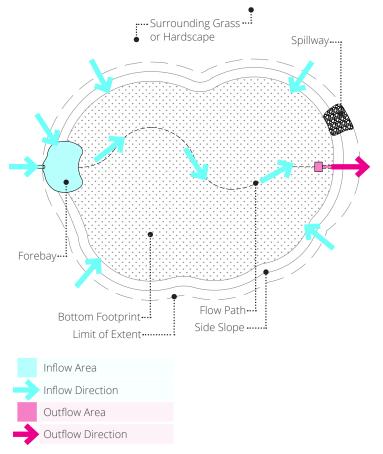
STORMWATER BASIN INFLOW AND OUTFLOW PLAN
